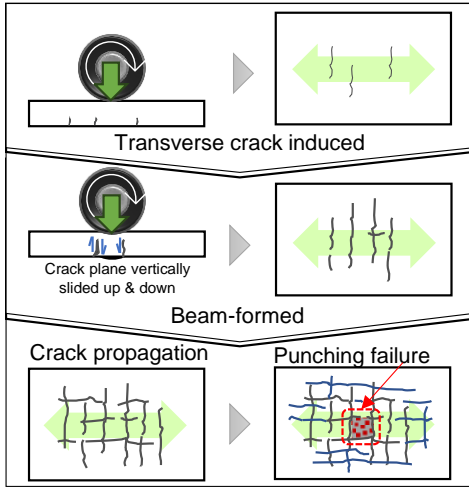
Typical fatigue failure mechanism and crack patterns under moving wheel loading
